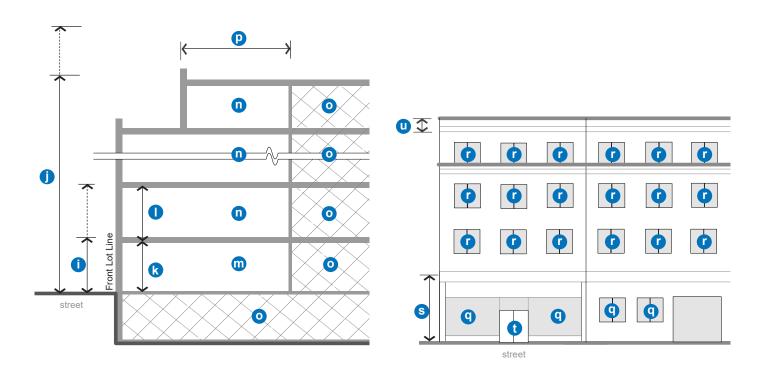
(C)(2) Mid Scale Shop Building: Height and Use Requirements
